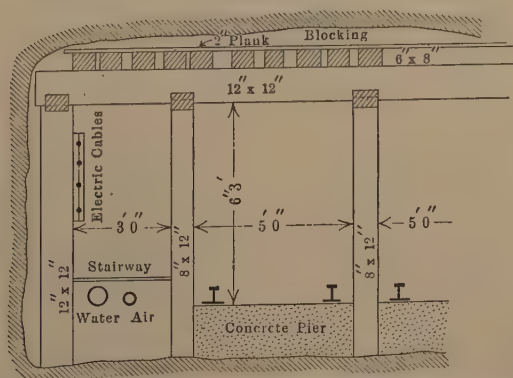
CROSS-SECTION OF PALMER SHAFT BELOW 1050 LEVEL.
